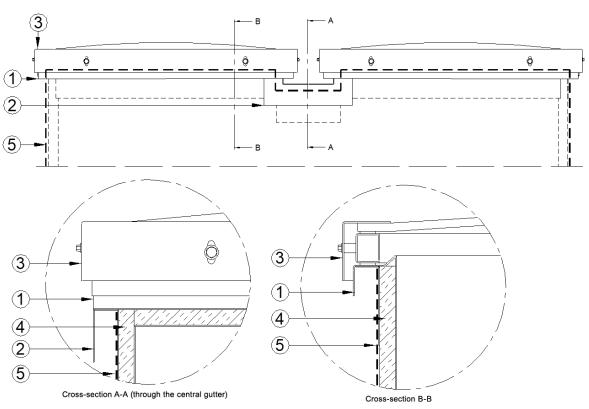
Installation diagram of waterproofing membrane on mcr PROLIGHT smoke vent.
